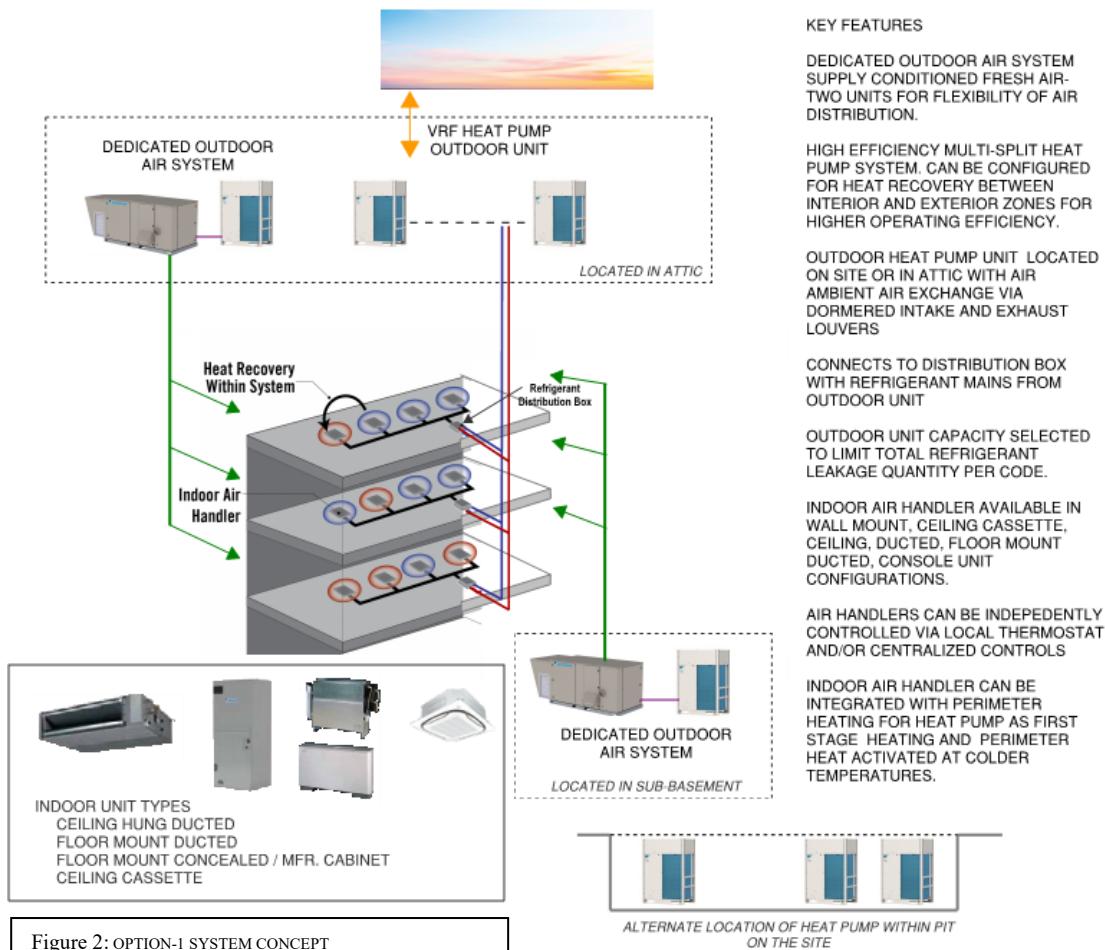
illustrates conceptual layout for Option-1. Figure-3 indicates potential location of heat pump units on site and Figure-4 indicates heat pump and ventilation unit arrangement in the attic. Figure 4 shows the ventilation unit and associated condenser in the basement.
